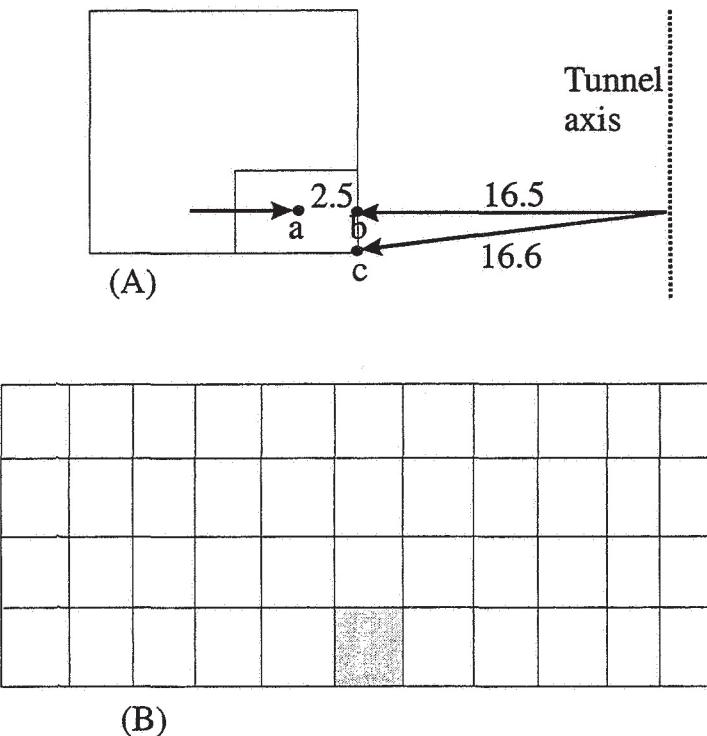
Rochussenstraat in Rotterdam: plan view (A), and cross-section of the building (B).
